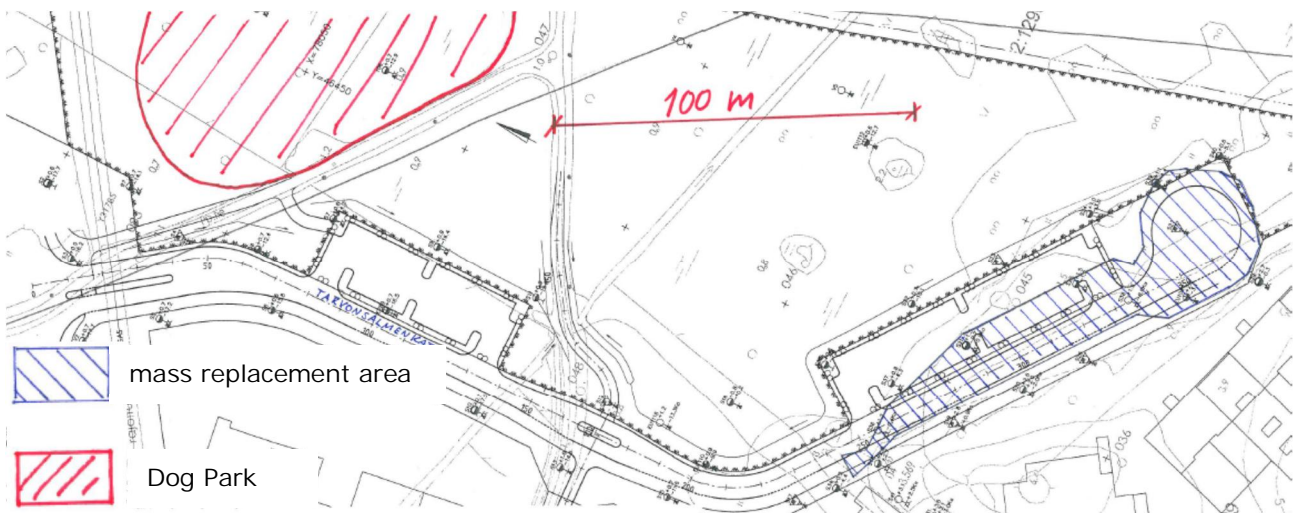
The location of the mass excavation area. The excavated excess clay and mud is used to the embankment of the Dog Park
